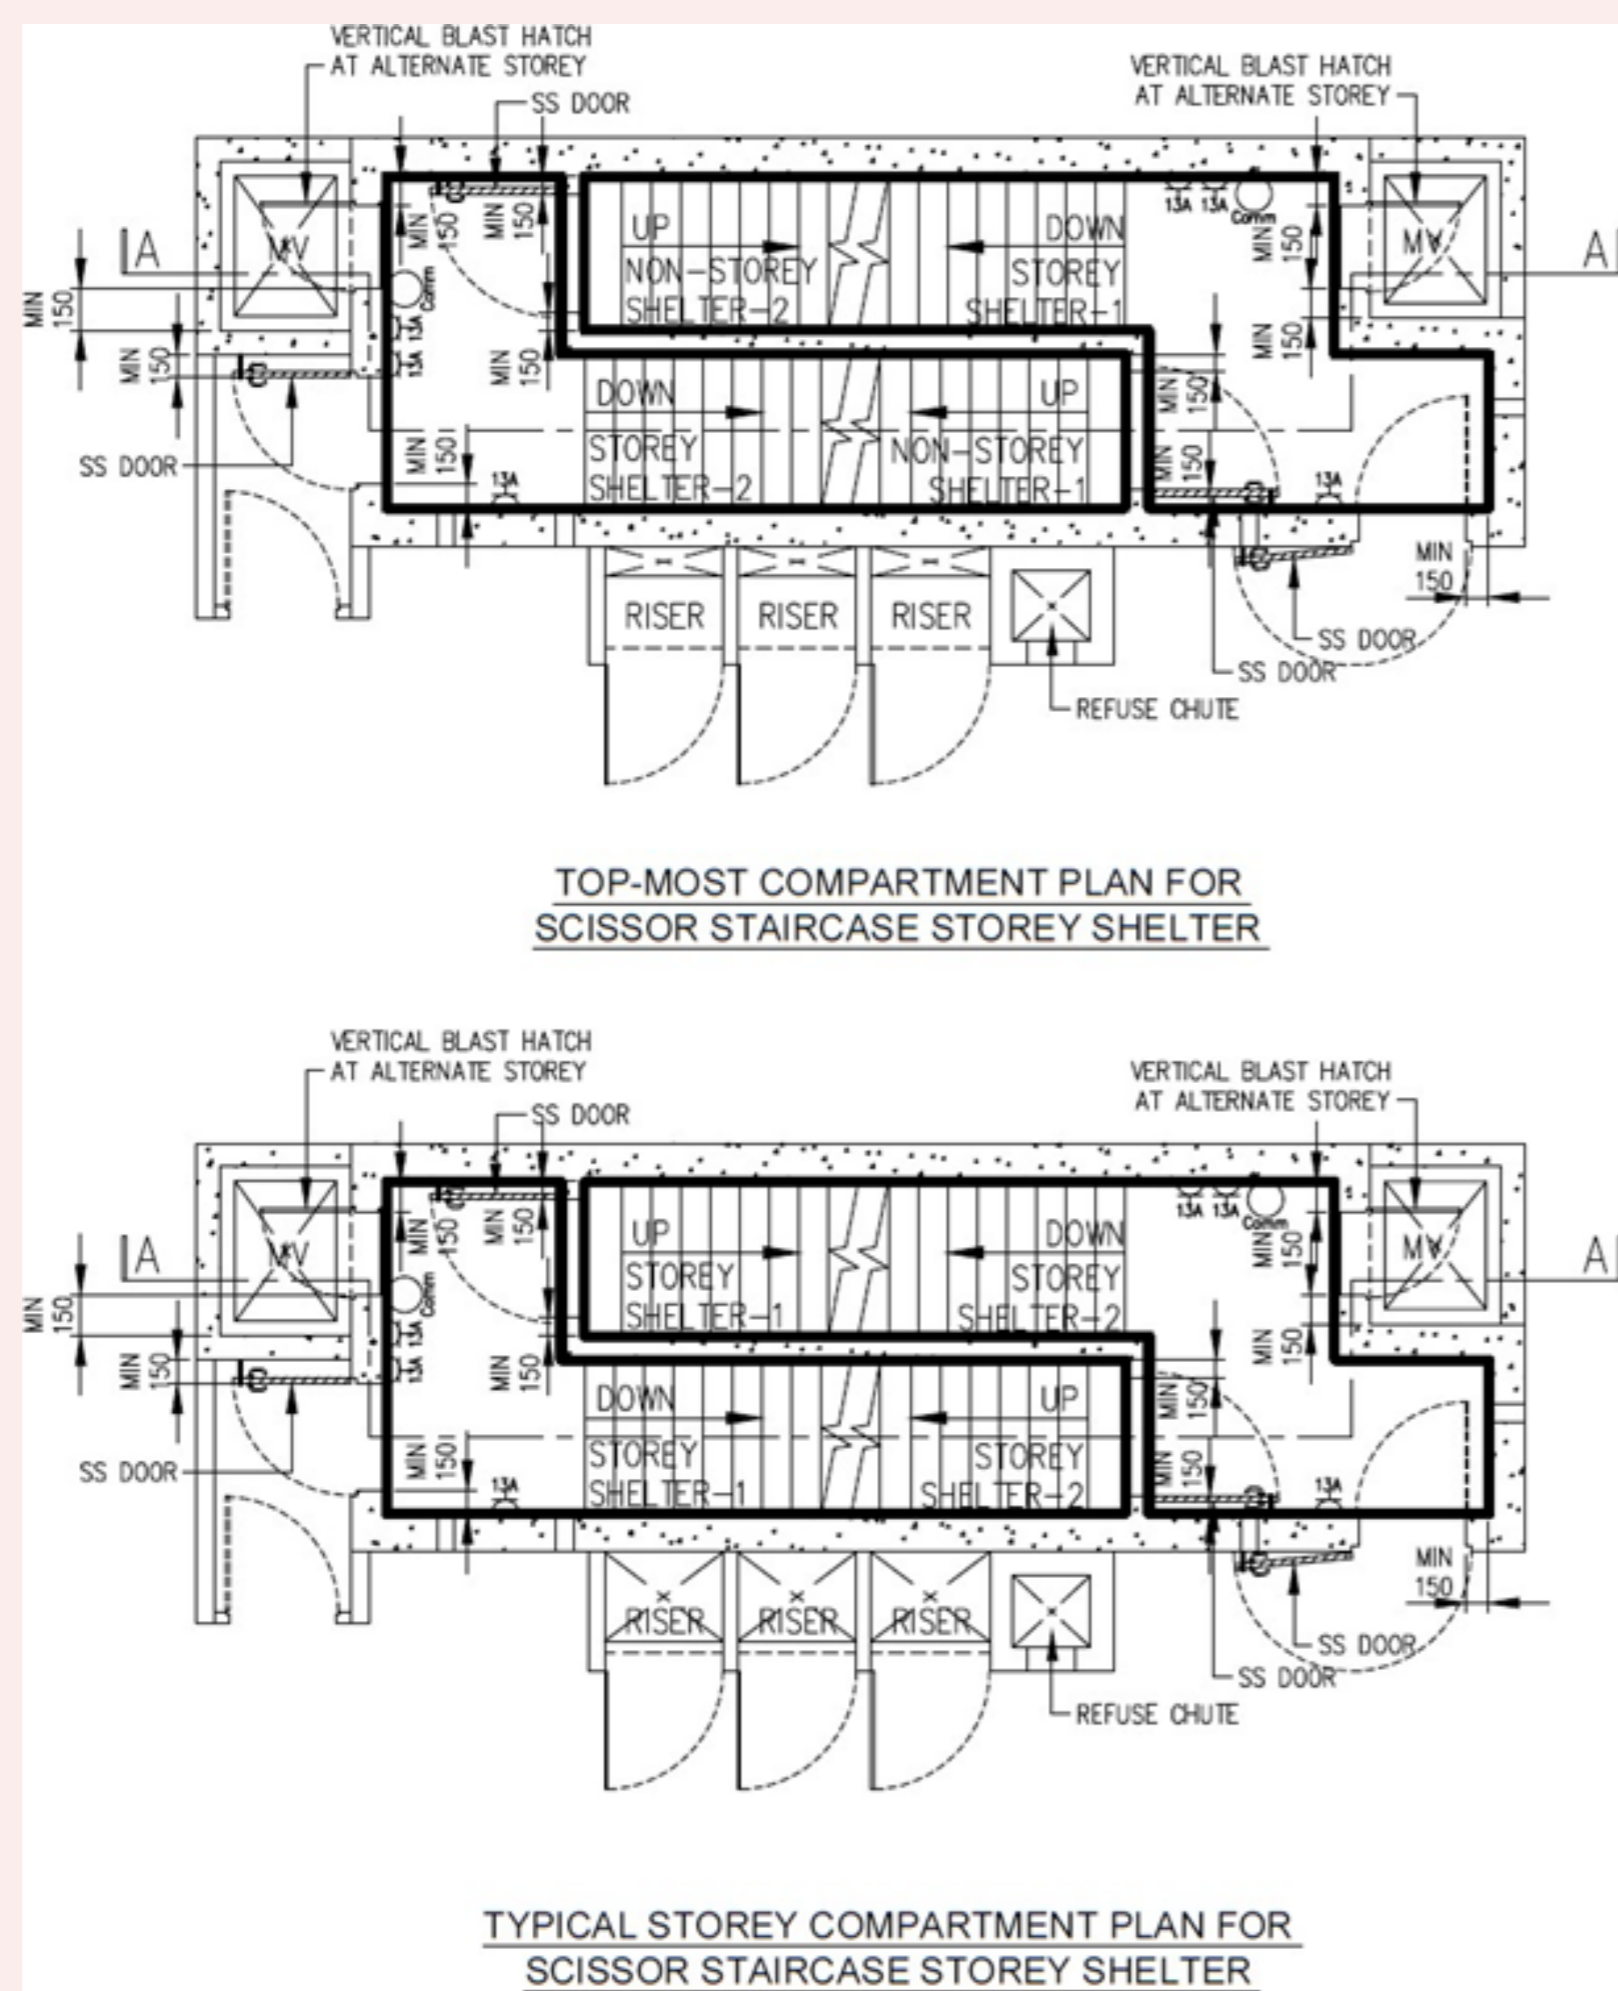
(j): SCISSOR S/C SS COMPARTMENT PLAN
